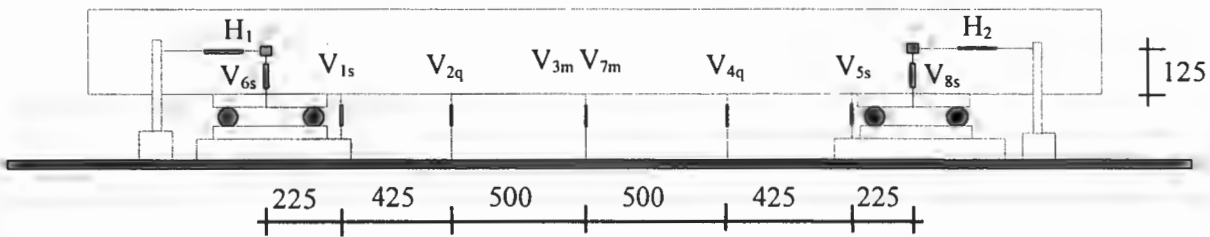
The position of displacement transducers placed between steel fibre reinforced concrete test beam and counter beams (measurements in mm).
